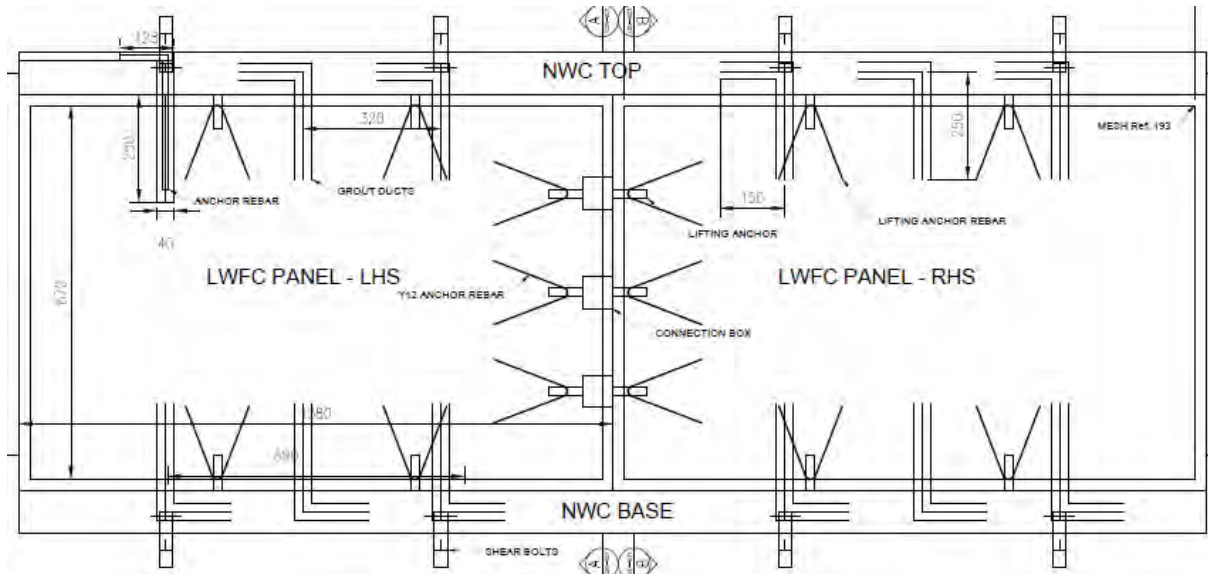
Wall connections of physical tests, a portion of the larger layout in Appendix B.
